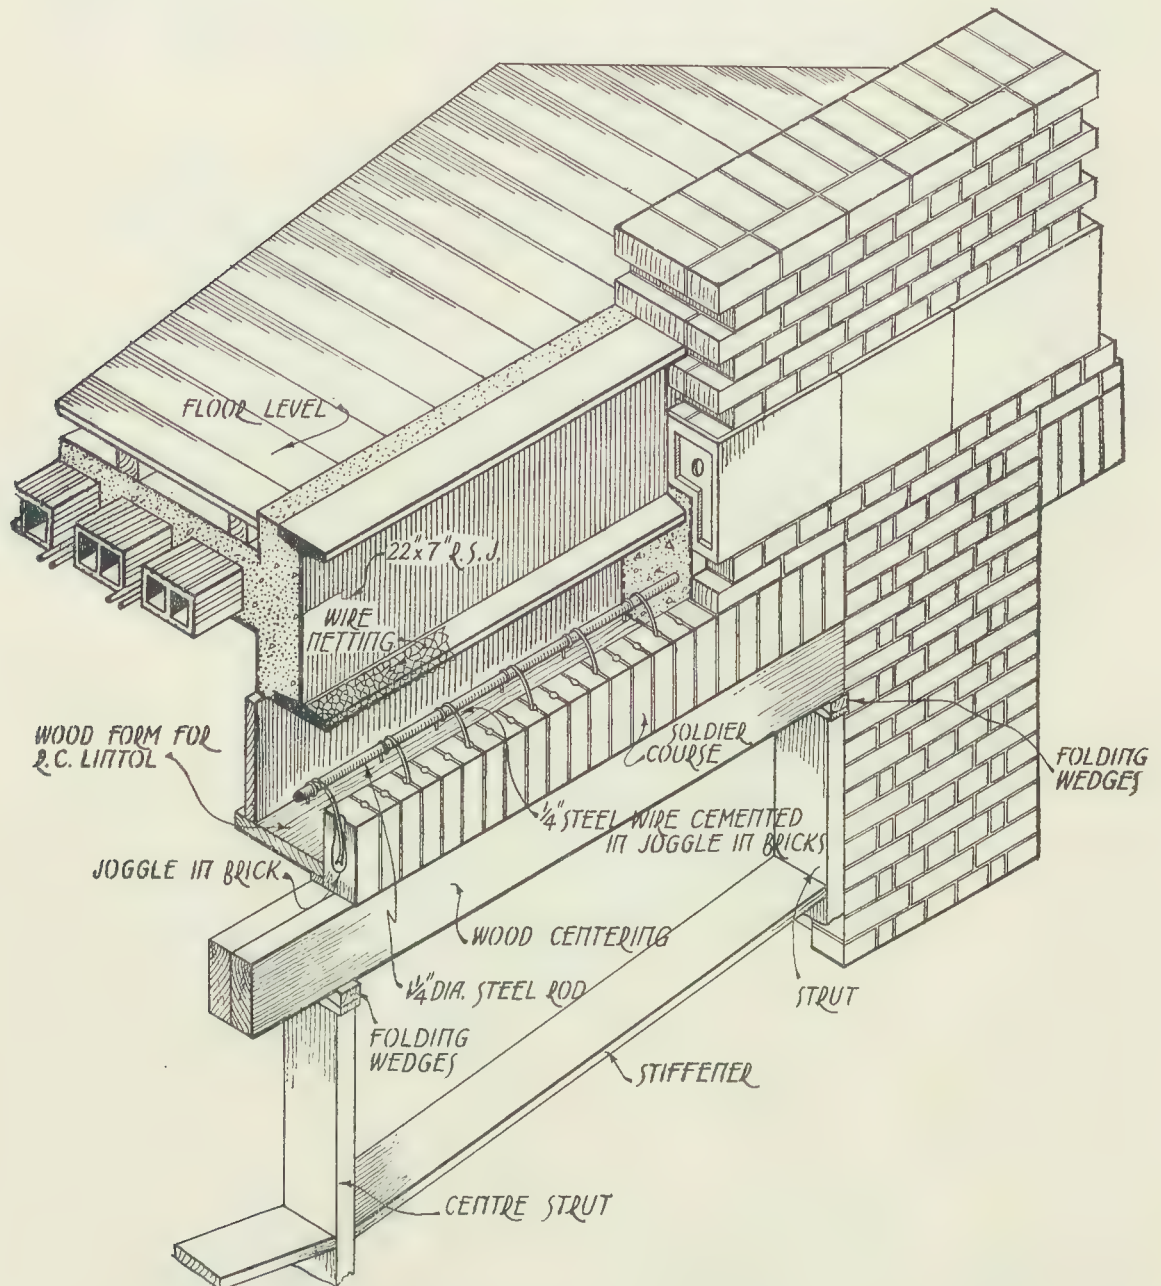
BRICK SOLDIER ARCH ATTACHED TO REINFORCEMENT OF CONCRETE LINTOL
